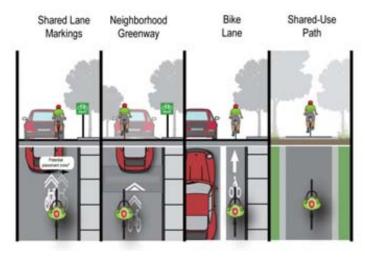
Bikeway facility types recommended in the Whitewater Bicycle and Pedestrian Plan
